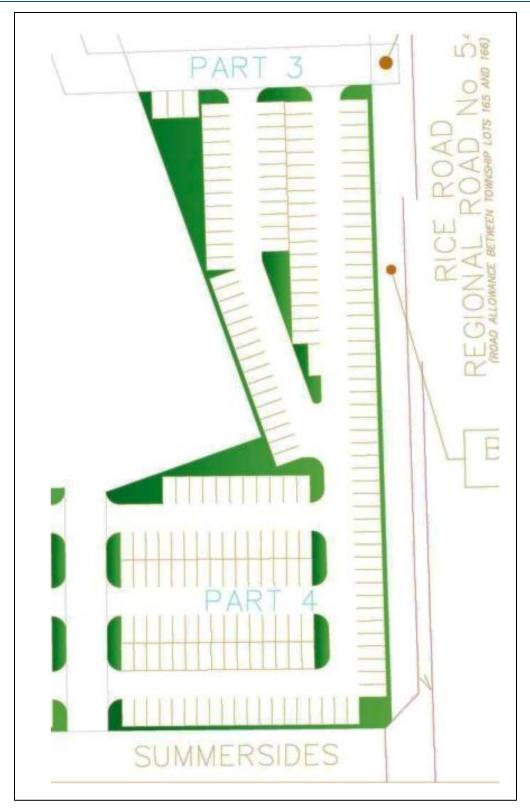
Example of Parking Lot Expansion (approx. 200 new spaces)
